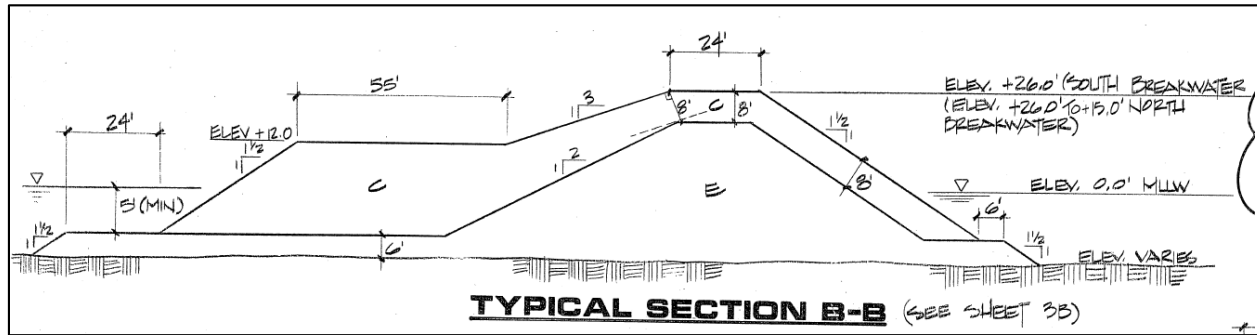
Typical berm breakwater section as designed by PN&D (1984).
